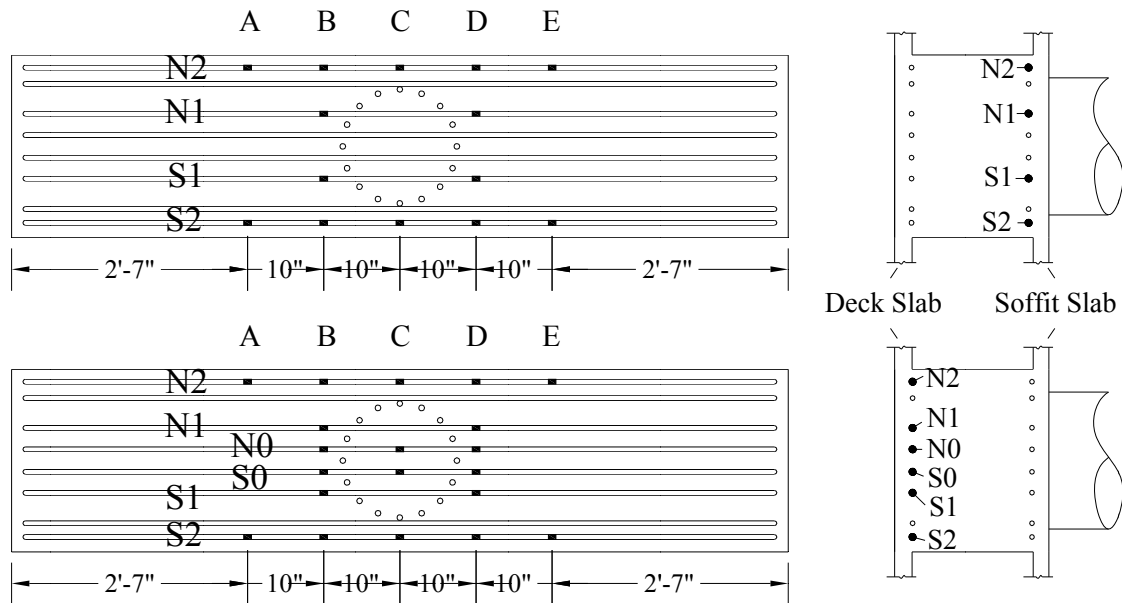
Layout of strain gauges used for the cap beam reinforcement
